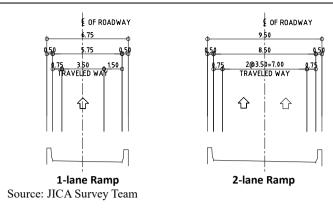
Typical Cross Sections of Interchange Ramps
